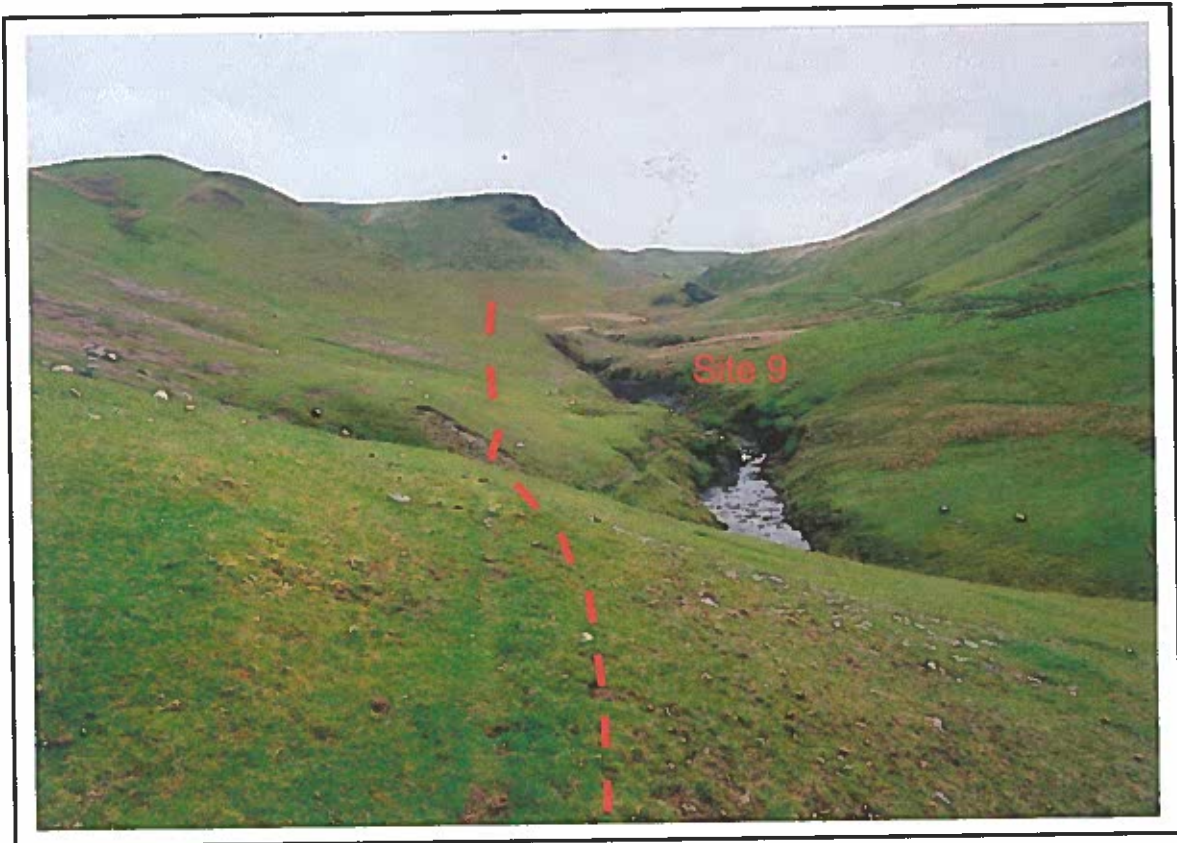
Showing the route of the proposed pipeline and site 9 - bridge and weir.
